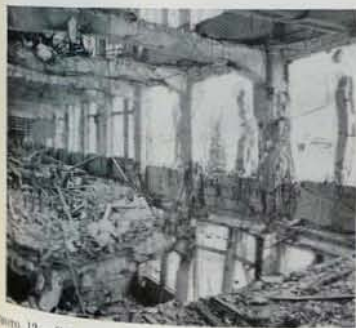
Group 1, high-explosive bomb damage to second floor, Building 7.
